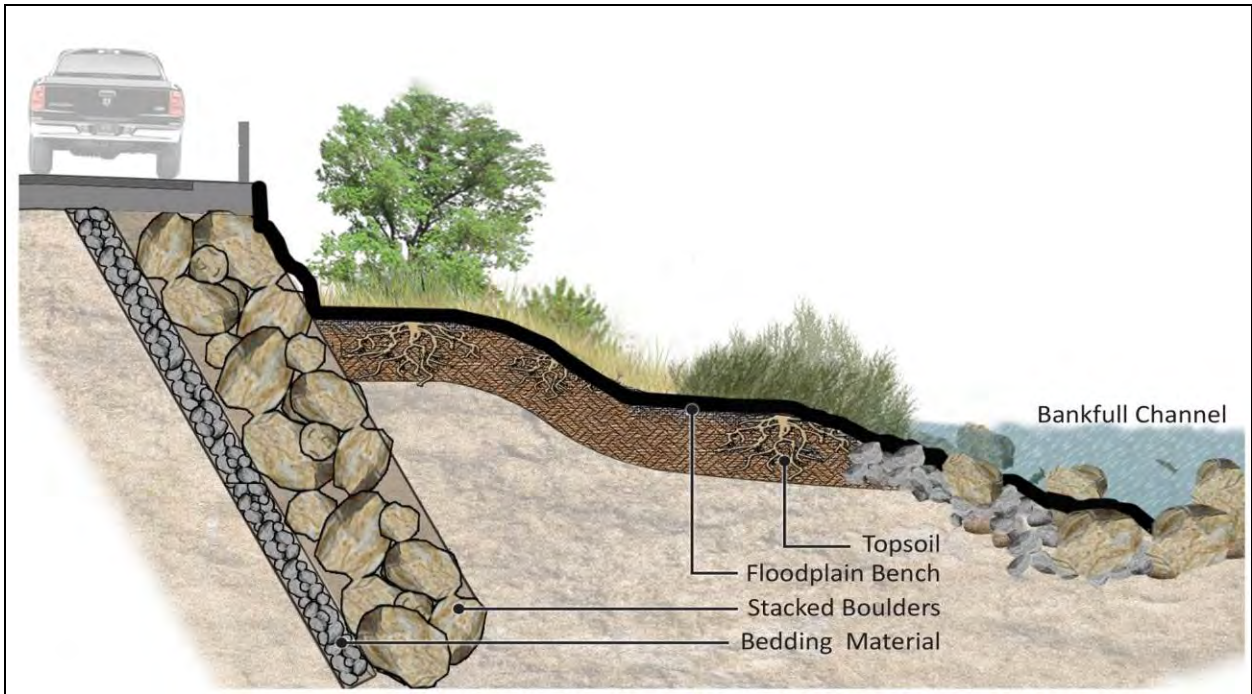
Bank Stabilization treatment, Stacked Boulders, 1H:1V slope or greater.
